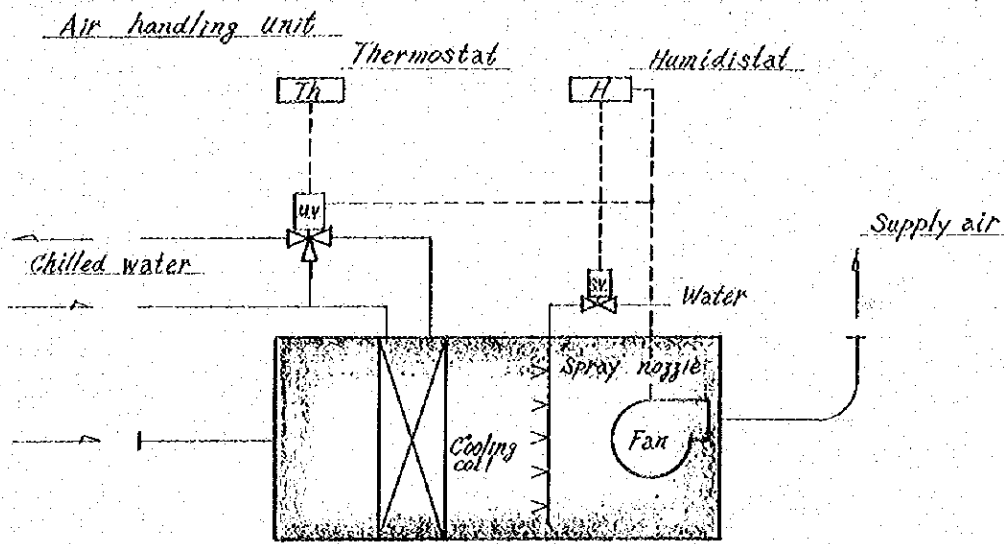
MACHINE EQUIPMENT OPERATION SYSTEM
